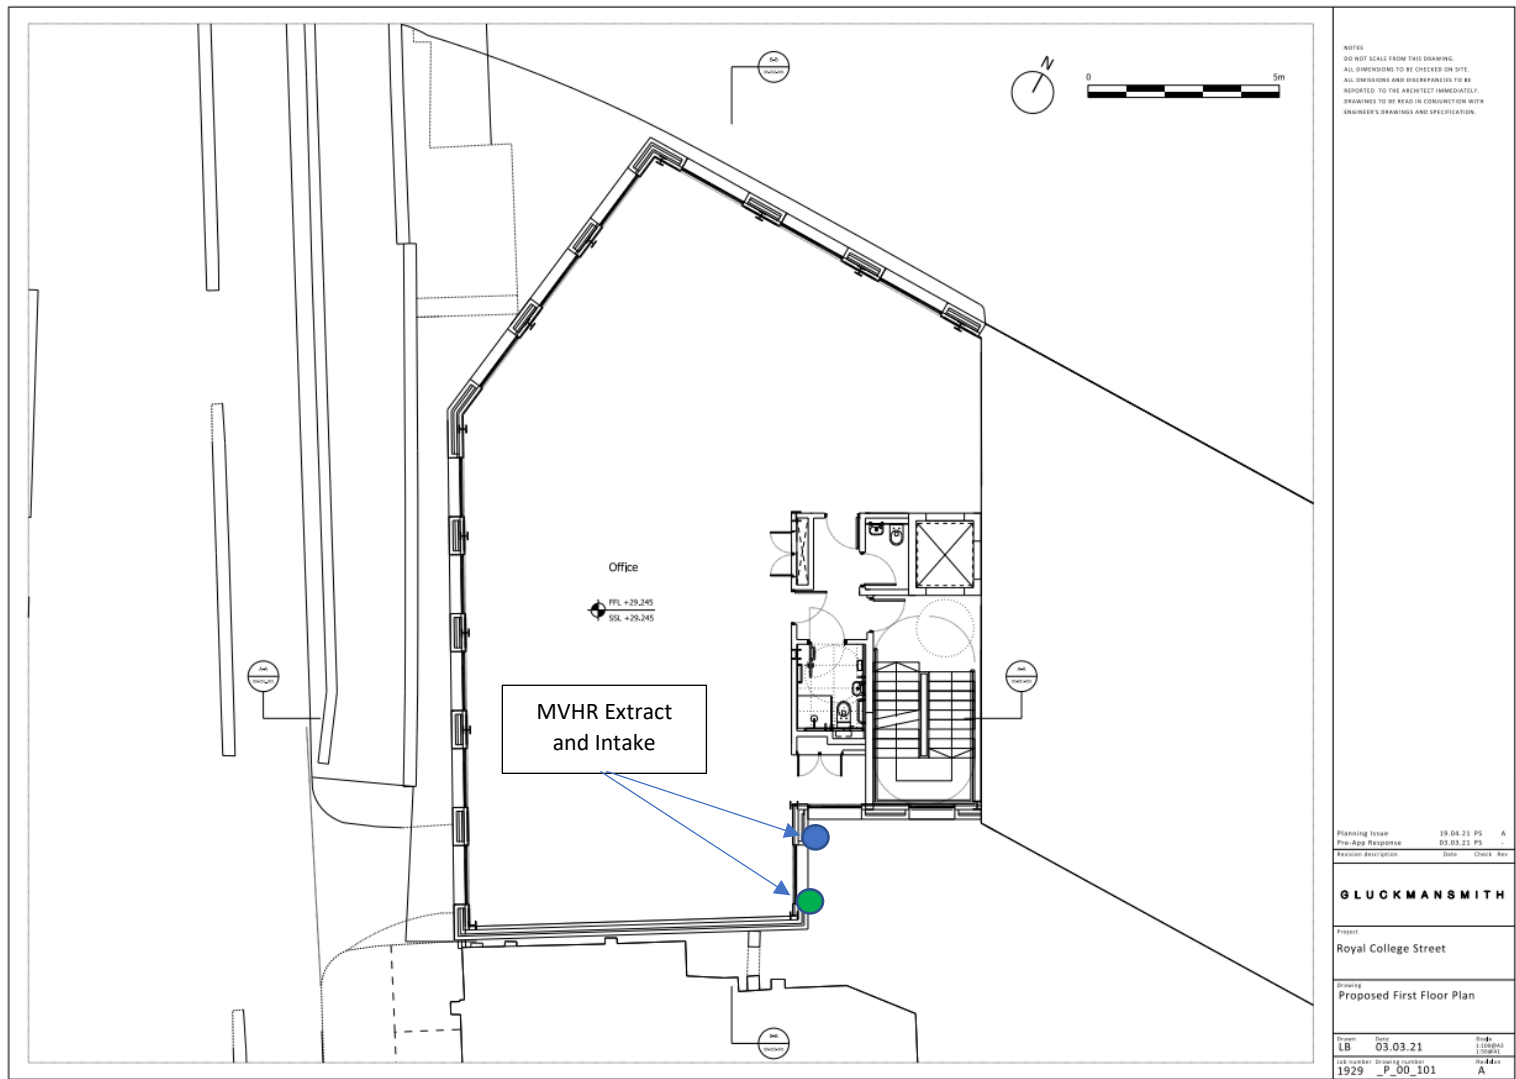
PROPOSED FIRST FLOOR PLAN
